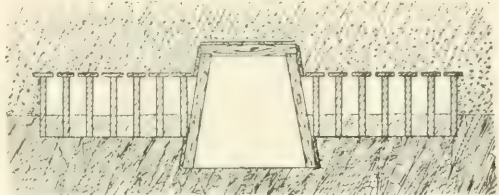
SIDE VIEW OF PANELLING STRIP.
